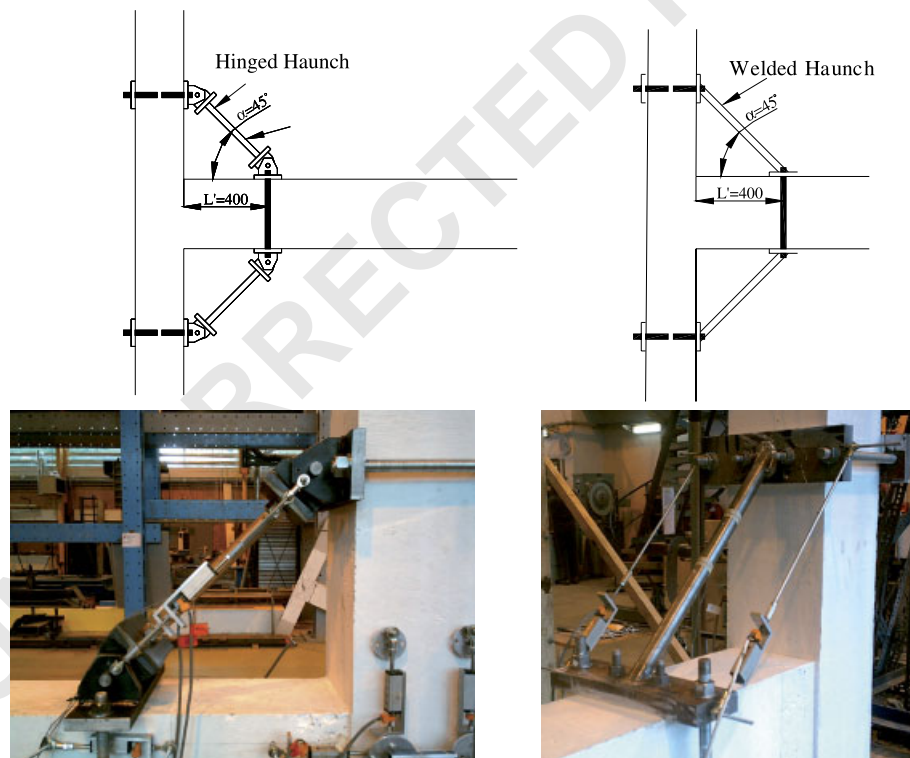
Alternative connection details for the haunch system: hinged (left side, implemented in specimens THR1 & THR2) or welded (right side, implemented in specimen THR3).
